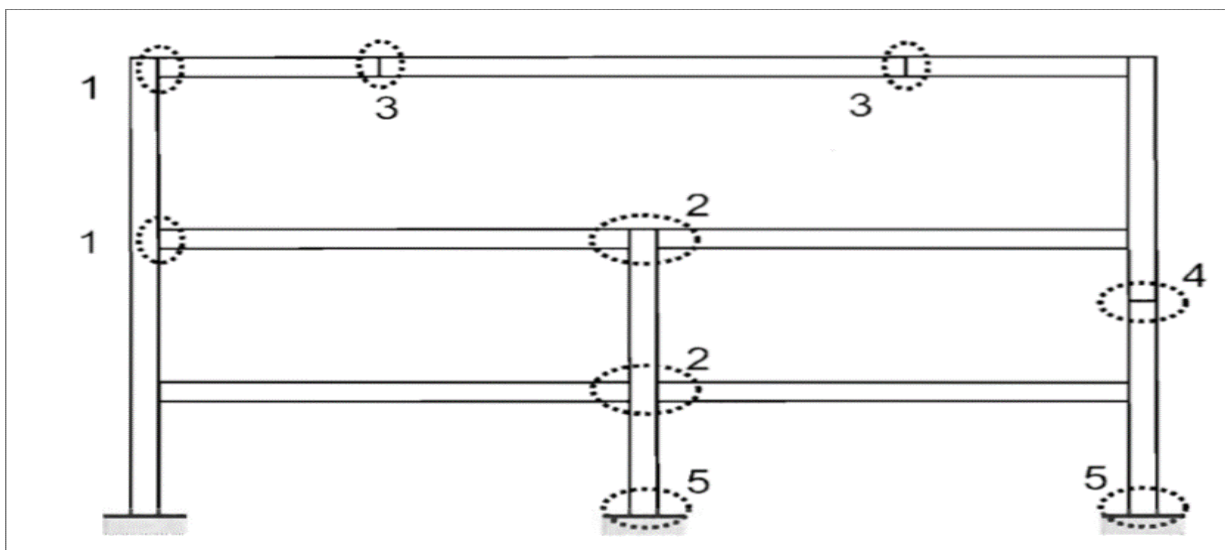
Types of joint in steel construction 1) Single-sided beam-to-column joint configuration; 2) Double-sided beam-to-column joint configuration, 3) Beam splice; 4) Column splice, 5) column base [5]
